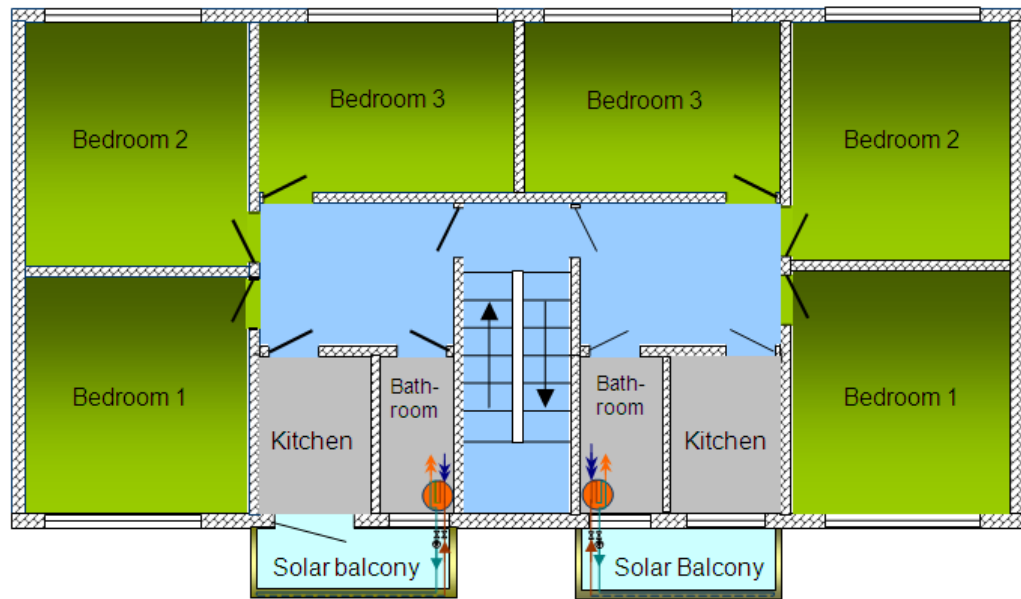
Layout of the novel façade-based solar LHP water heating system in a typical flat.
